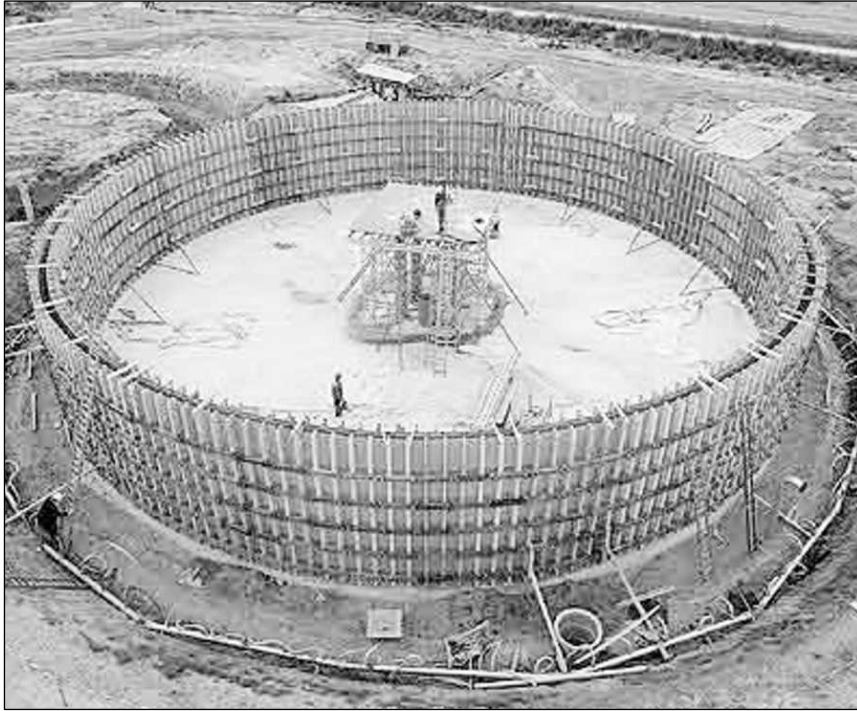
GRV Circular Wall Formwork (Courtesy PERI).
